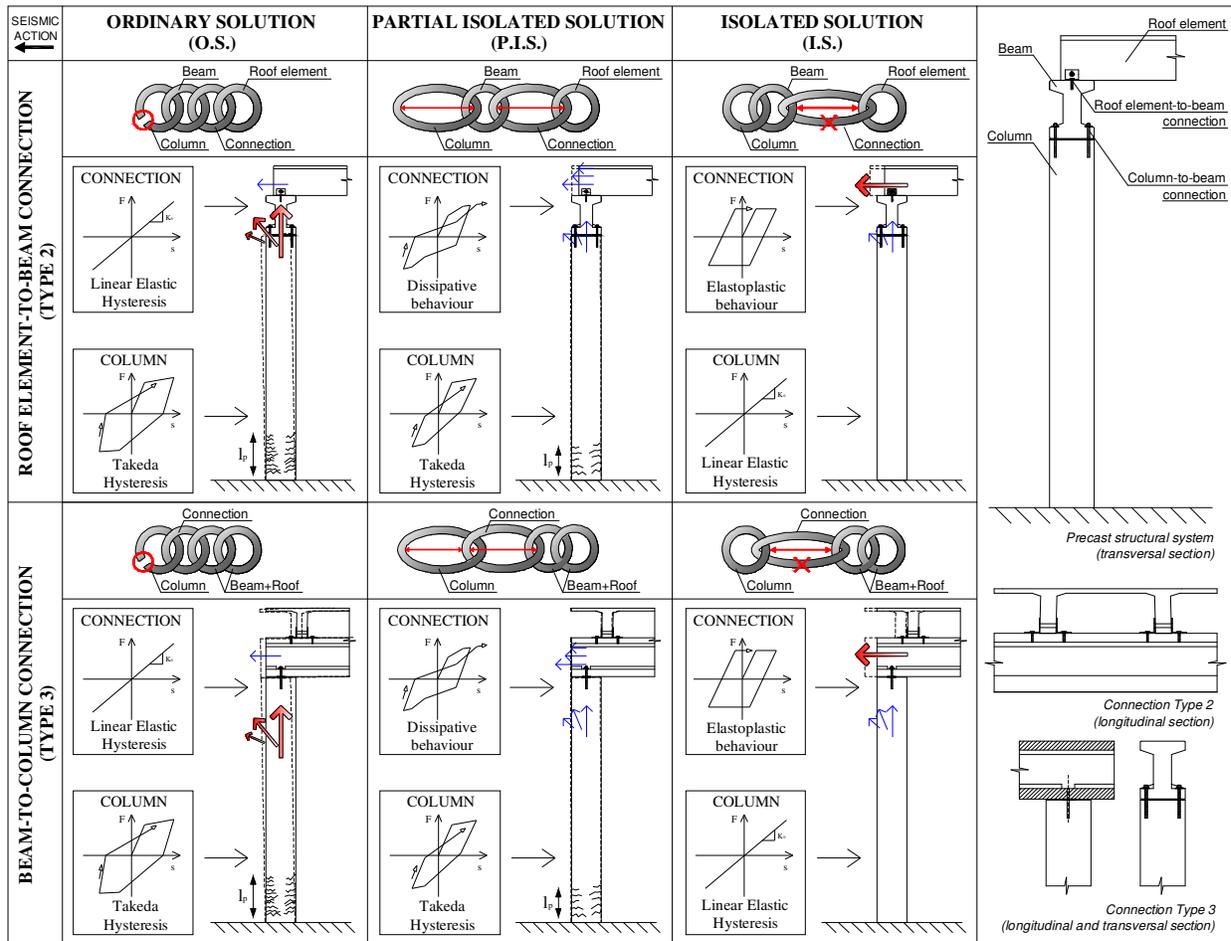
Different solutions of roof element-to-beam connections and beam-to-column connections
